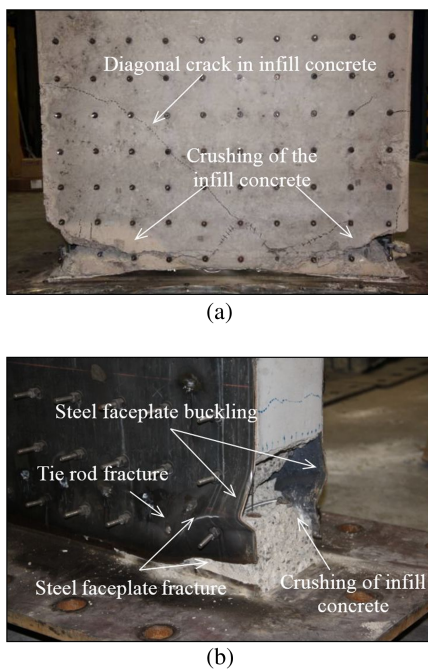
Damage to SC2 at 3.3% drift angle: (a) infill concrete; (b) SC wall
